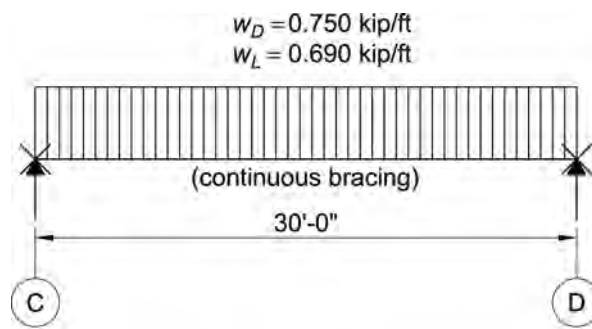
Loading and bracing diagram for typical 30-ft interior floor beams.
